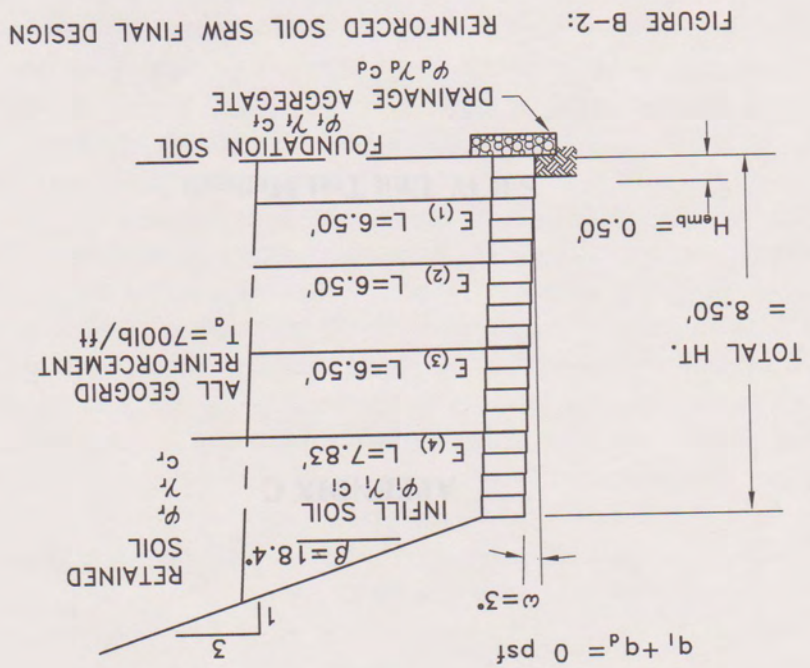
REINFORCED SOIL SRW FINAL DESIGN
